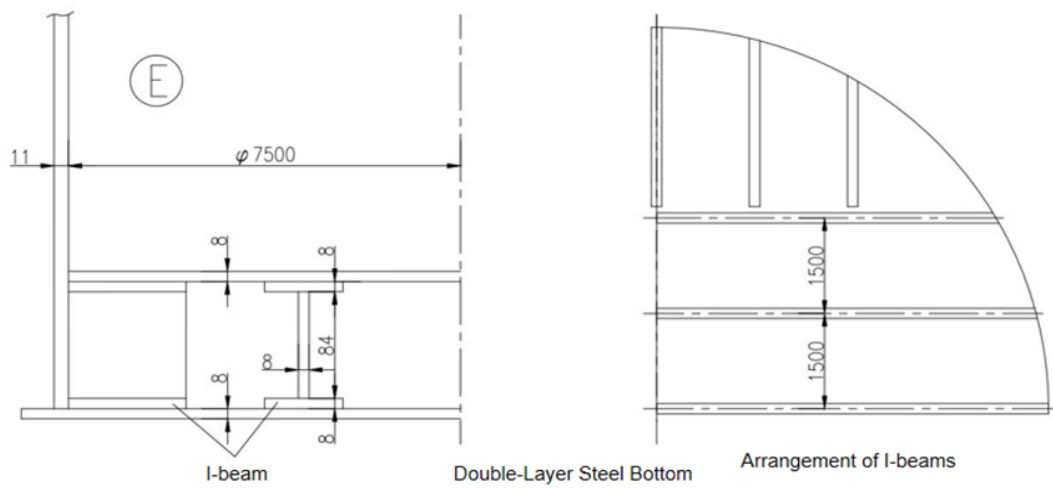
Finite element model of Structure E, supported by a steel I-beam grid system. The left panel shows the cross-sectional layout of the double-layer bottom, while the right panel illustrates the arrangement of I-beams for enhanced stiffness and integrated leak detection space (mm)
